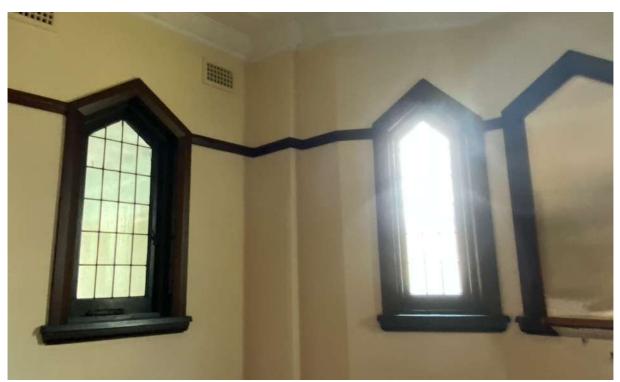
The lead-light timber windows on the first floor are to be retained.
